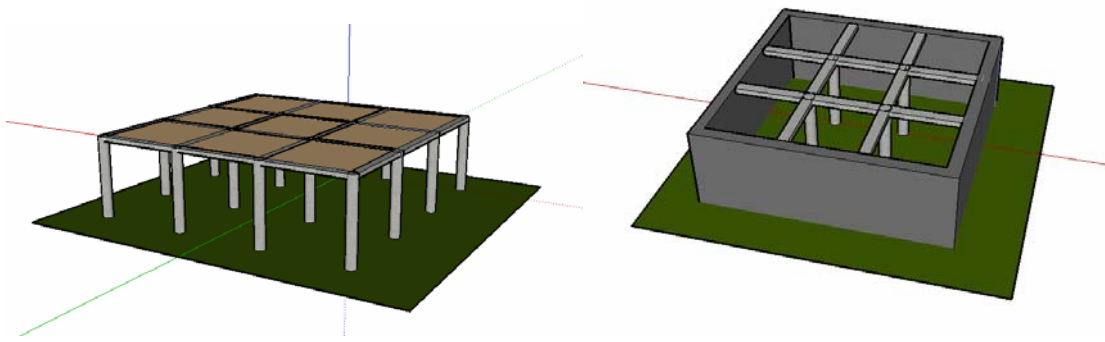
(1). Common rigid frame system, e.g. two way beam and slab system; (2.) Lateral bracing around periphery only.
